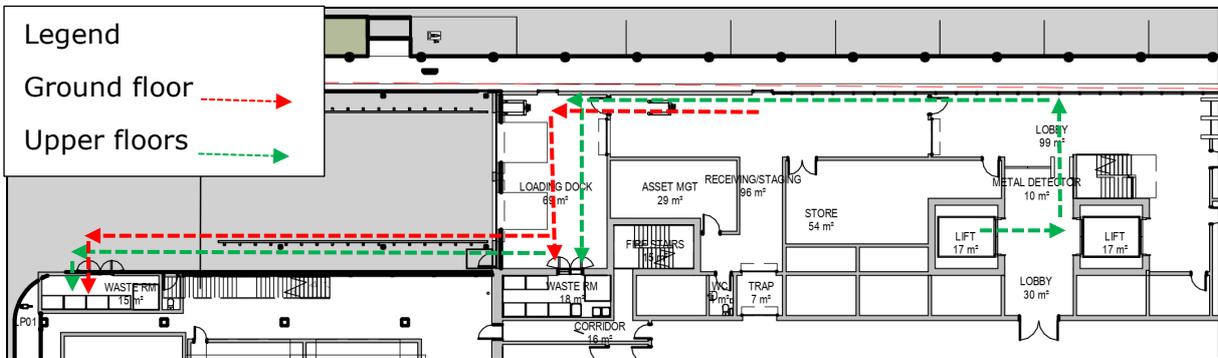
Buildings C and D - internal transfer of waste and recycling from ground floor and upper floors
